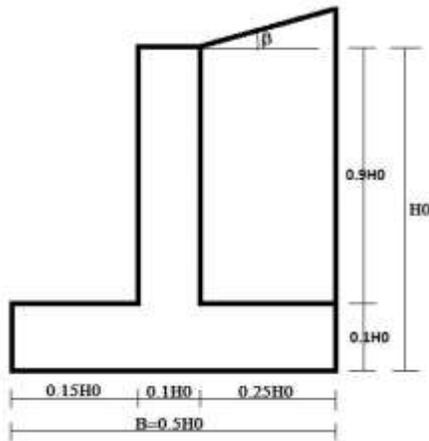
Geometrical properties of the rigid cantilever retaining wall Considered in the present study
